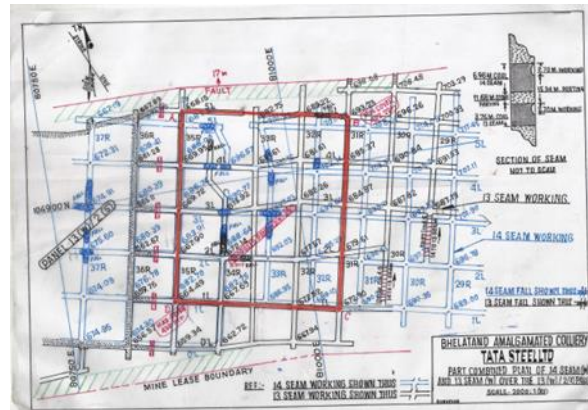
Part plan showing the roof fall details of the 3(S) panel in 13 seam working.
